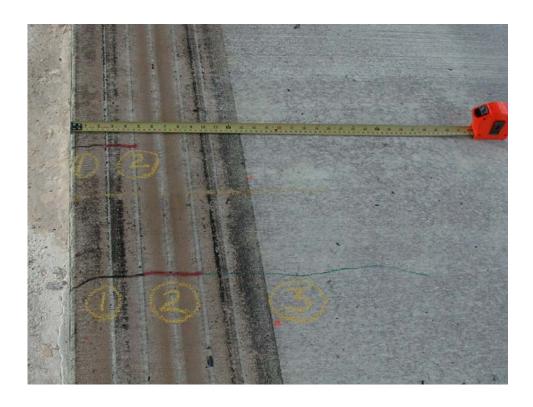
Crack propagation at the mid-edge of Slab 1G with additional loading
